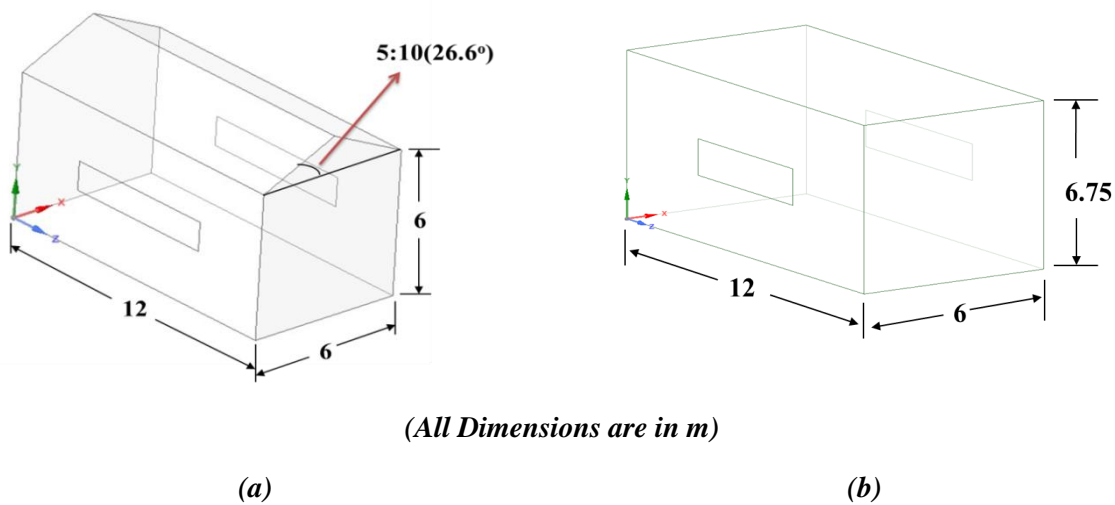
Schematic view of the building model (a) Gable roof (b) Flat roof
